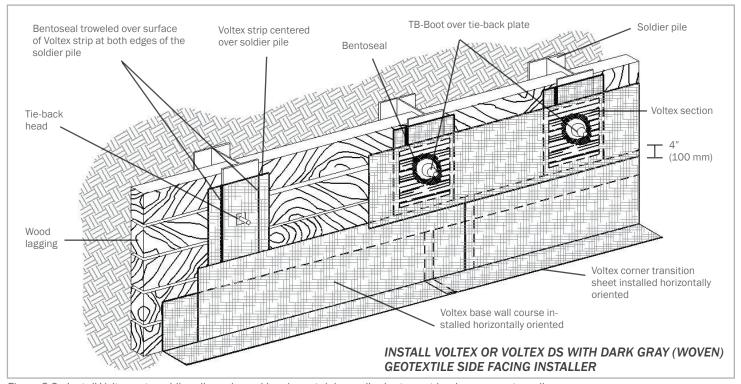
Install Voltex onto soldier pile and wood lagging retaining wall prior to cast-in-place concrete wall.
